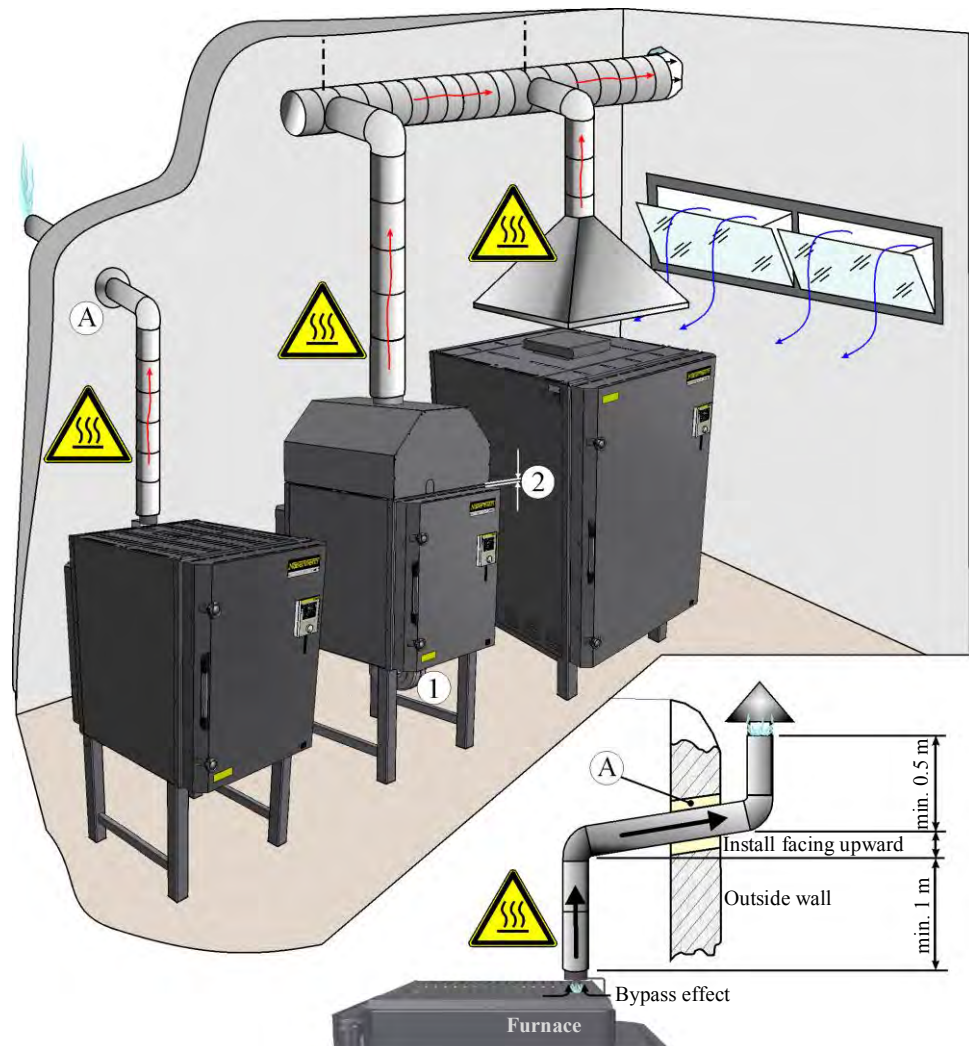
Example: Assembling exhaust air piping (similar to picture)
